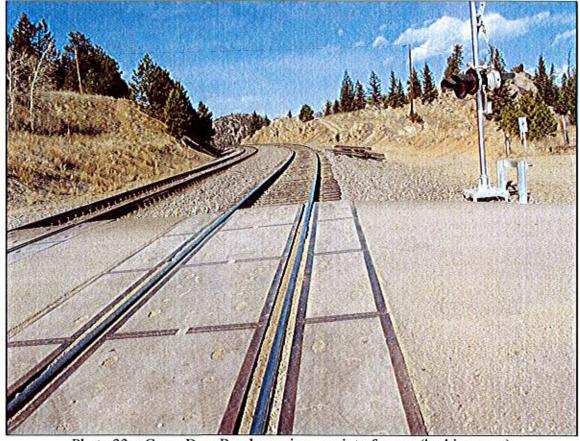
Gross Dam Road crossing - point of curve (looking west)
